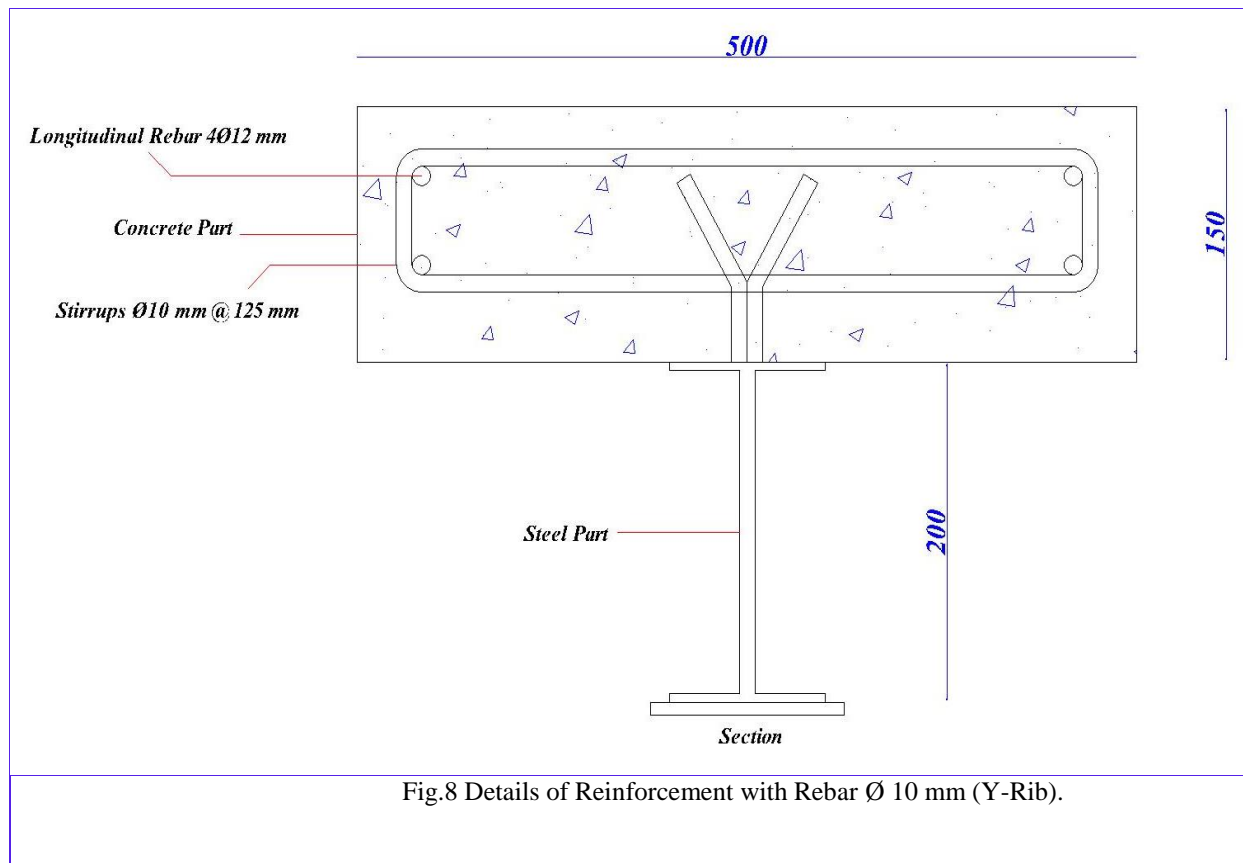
Details of Reinforcement with Rebar Ø 10 mm (Y-Rib).
